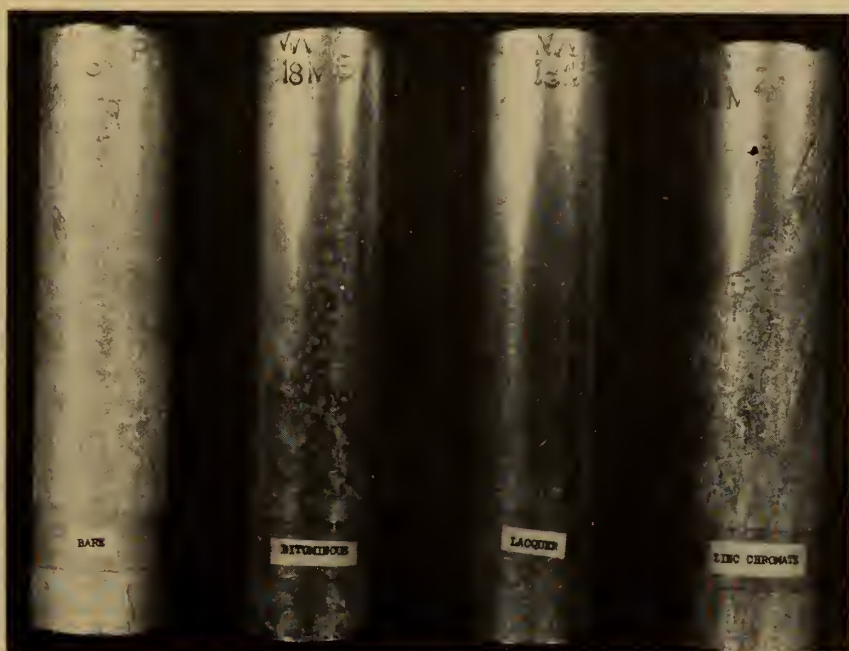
Alcan 3S conduit specimens removed from standard brick mortar pier submerged 18 months.
